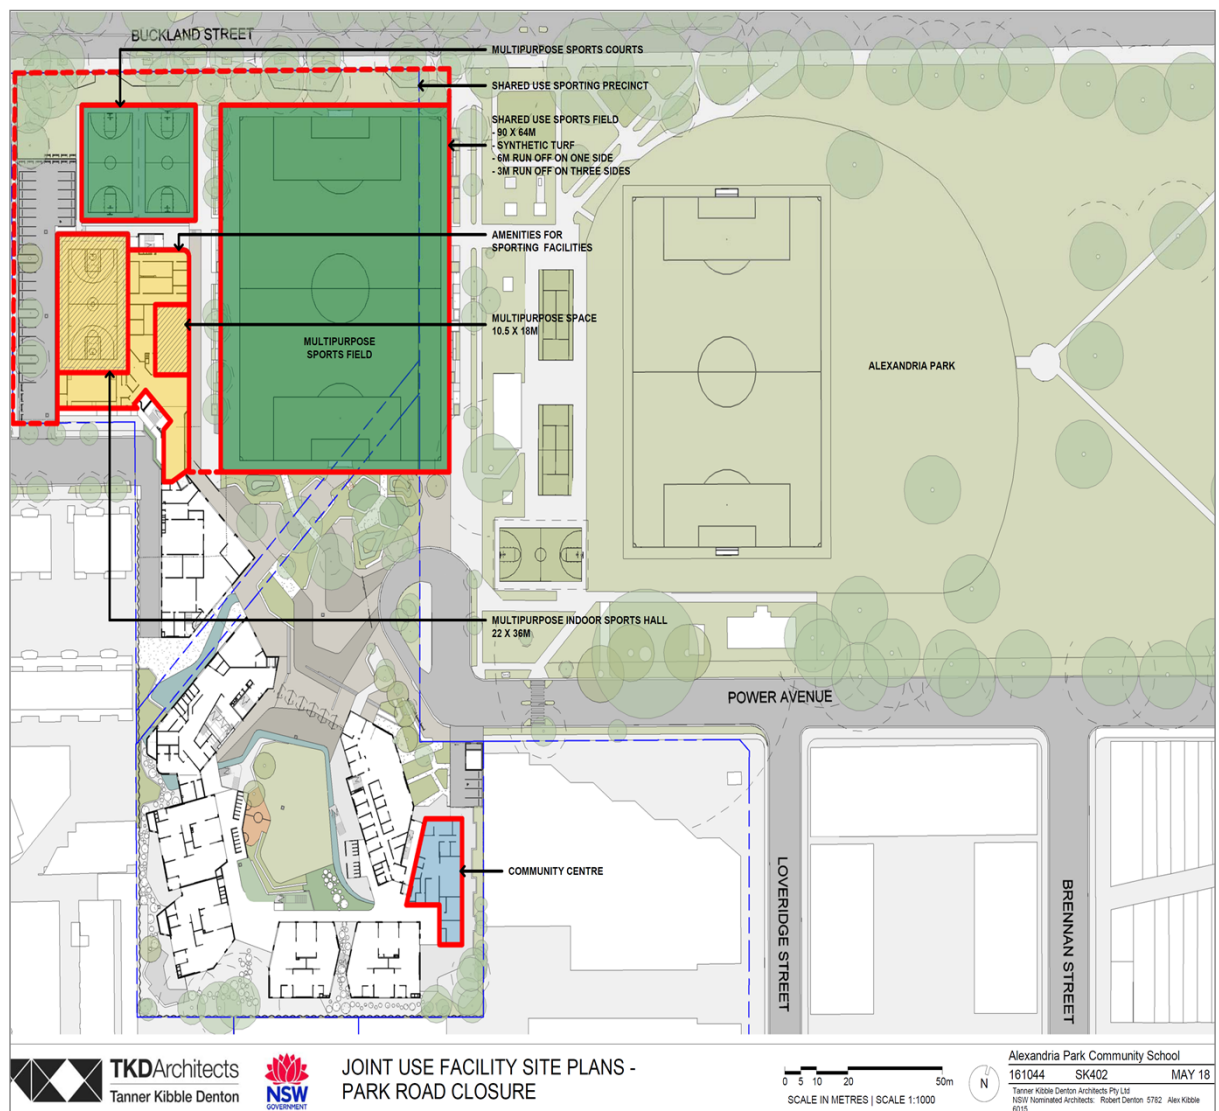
Alexandria Park Community School - Joint use facilities (Image: Design | TKDArchitects. Source: Department of Education 2018)
